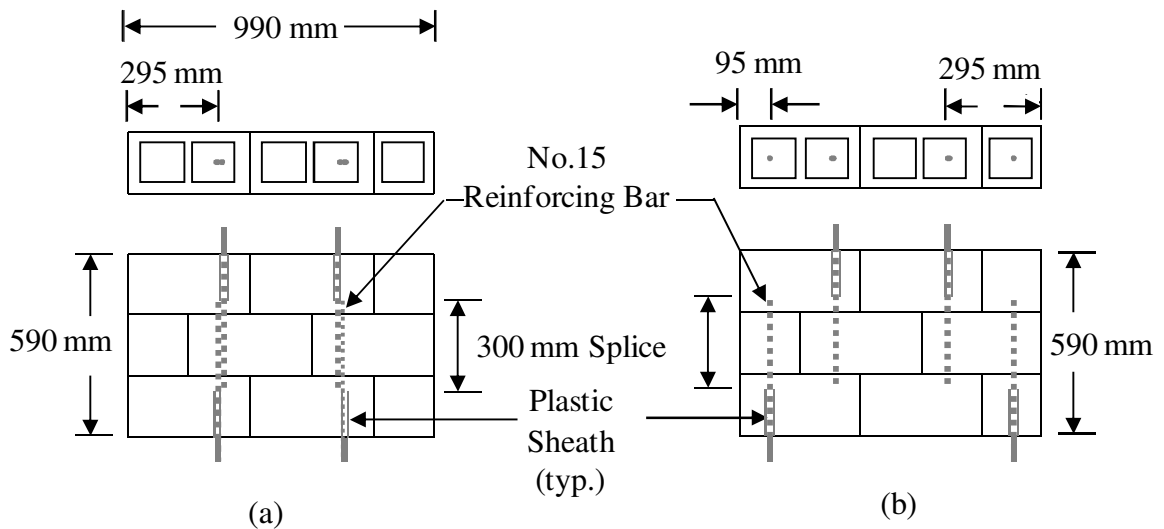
Elevation and plan of double pullout specimens with: (a) contact lap splices, and (b) non-contact lap splices.
